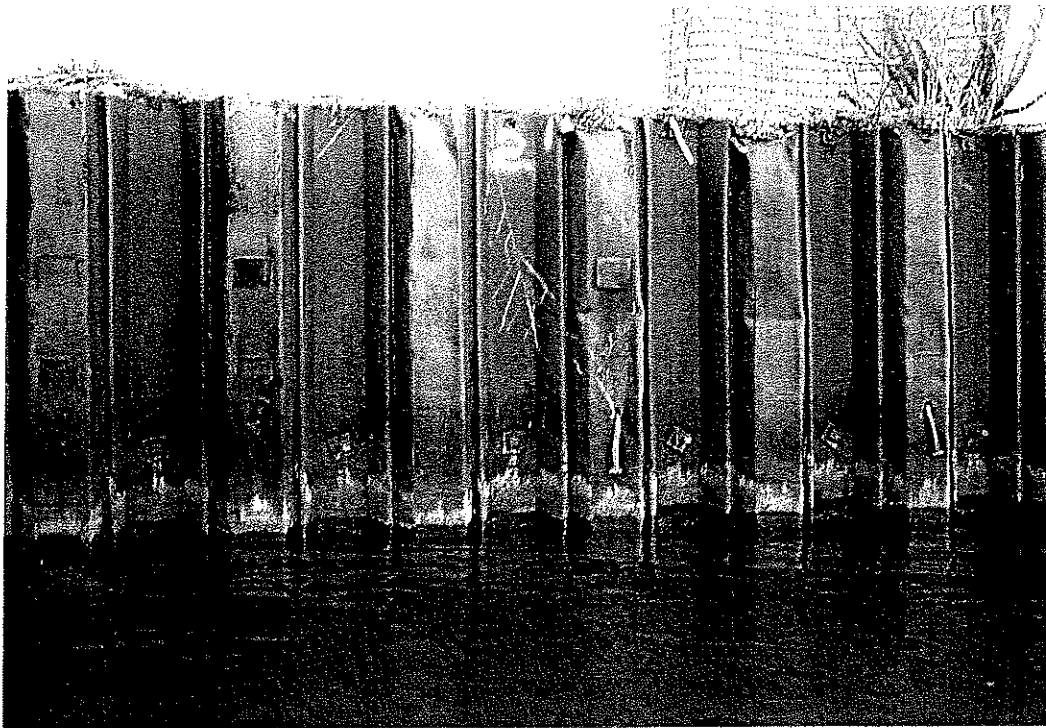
Dockwall at Station 0+30, Looking Northeast.
